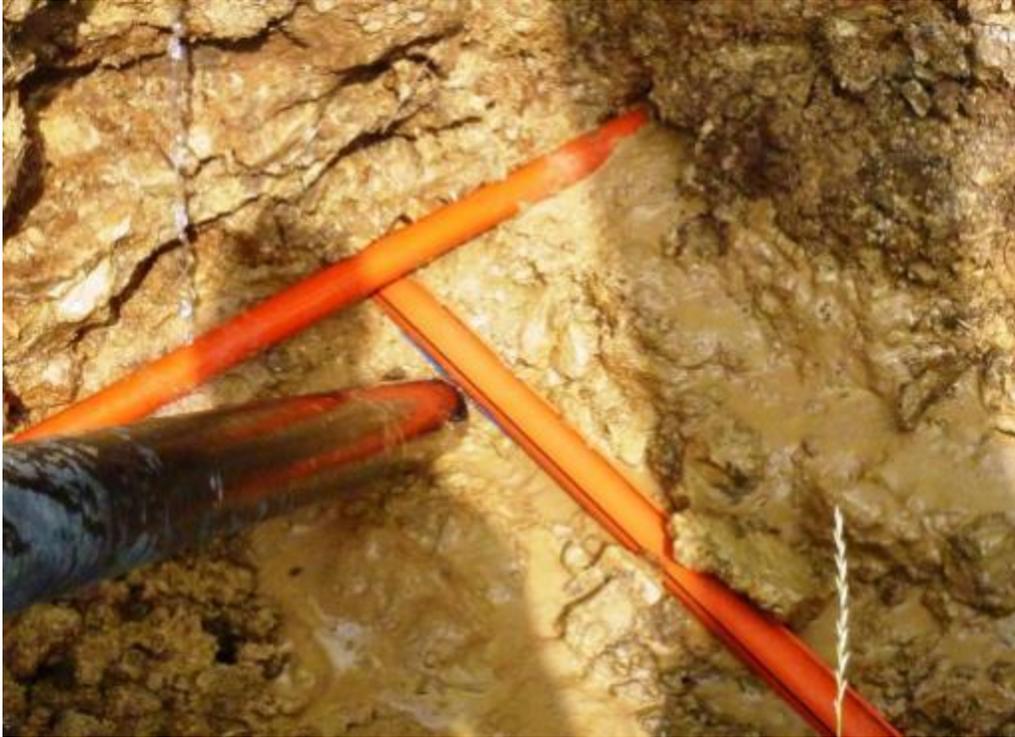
Pipe and Wires Crossing Another Existing Conduit
